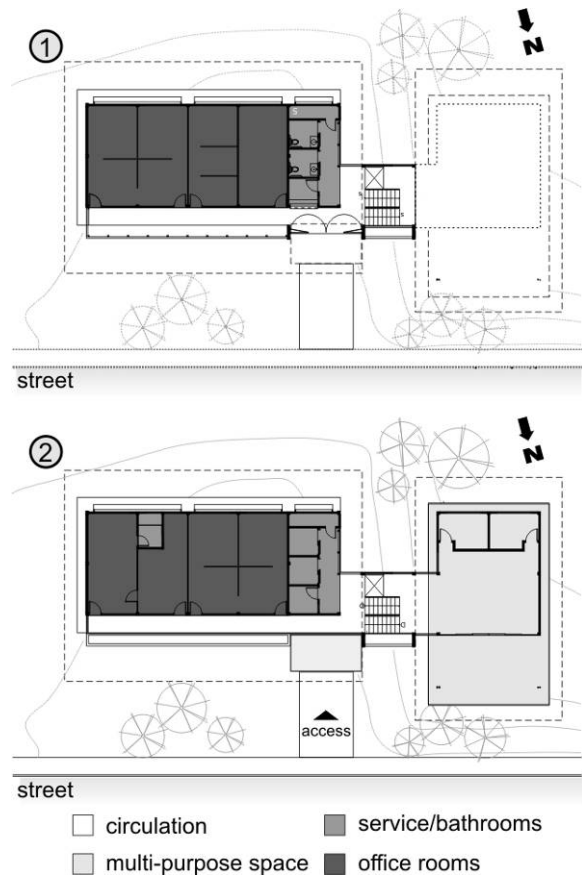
Floorplans with zoning: (1) ground level and (2) second level
